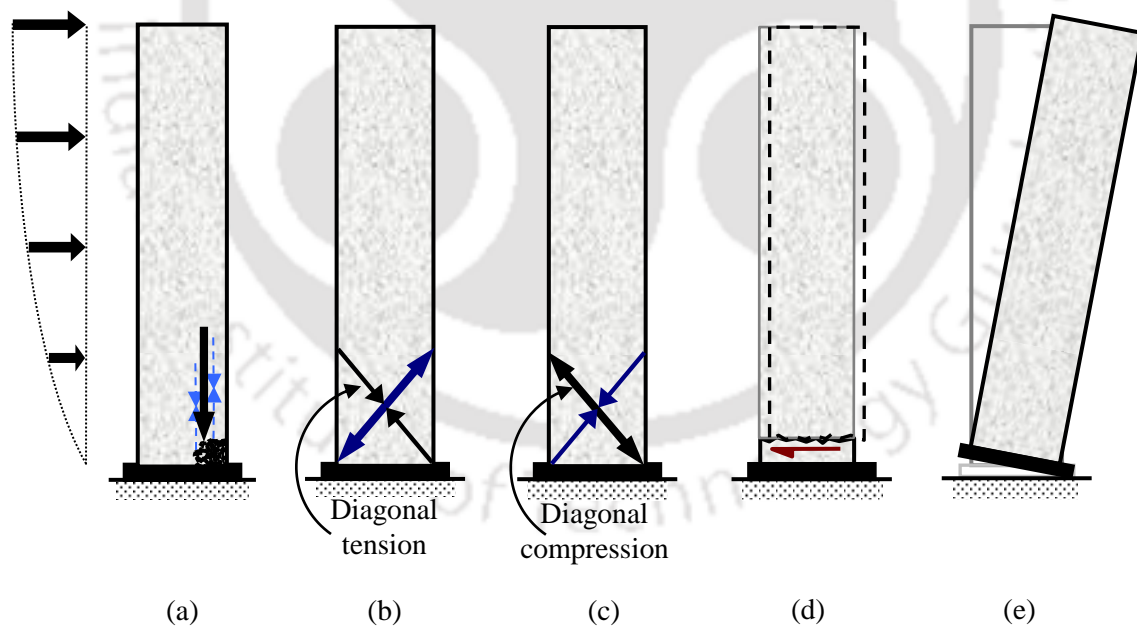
Failure modes in slender walls: (a) flexural compression, (b) diagonal tension, (c) diagonal compression, (d) sliding and (e) rocking. (Dasgupta, 2008).
